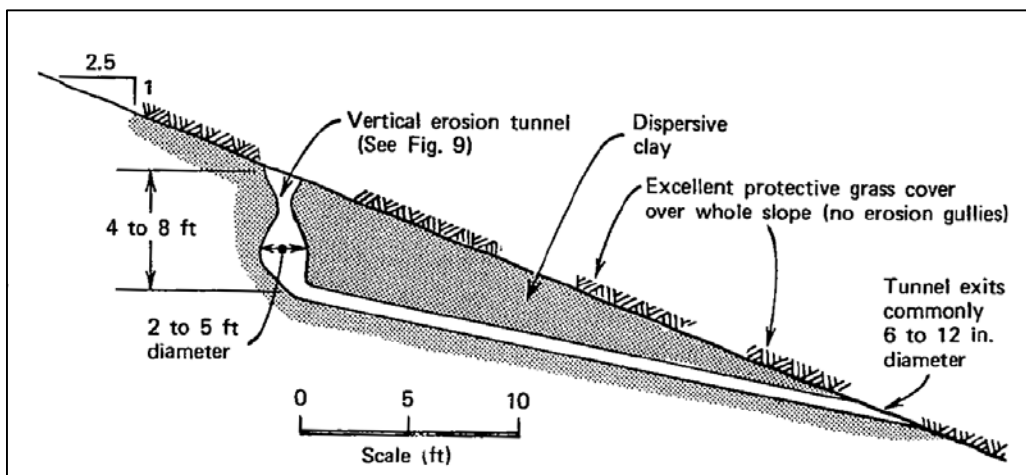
Peculiar rainfall erosion tunnels (horizontal) and jug (vertical, jug-shaped void) observed on downstream slope of Wister Dam. These features are common in embankments constructed of dispersive soils.
